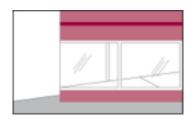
A typical straight front façade with display windows flanking the entrance to either side. Also, this is a rather typical mall shop front, with an all-glass façade, floor-to-ceiling glass panels, and no bulkhead. Merchandise needs to be raised up off the floor with risers or on platforms.
